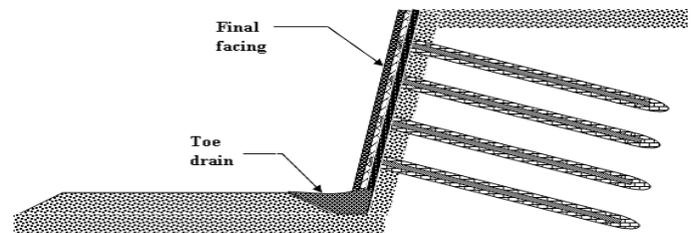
Construction of Permanent Facing (Byrne *et al.*, 1998)
